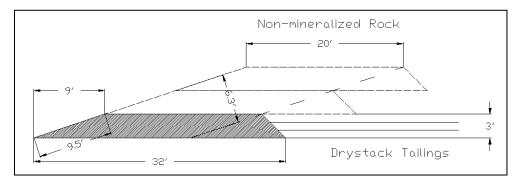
Typical Cross Section of Shell 2 and Shell 3
